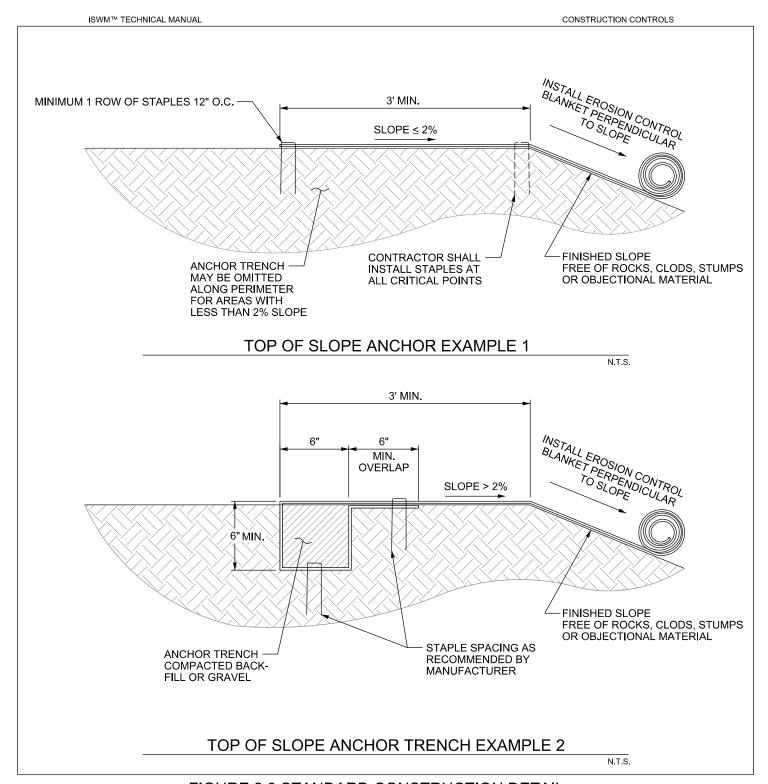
STANDARD CONSTRUCTION DETAIL - ANCHOR EXAMPLES FOR TEMPORARY EROSION CONTROL BLANKETS (2 OF 3)
